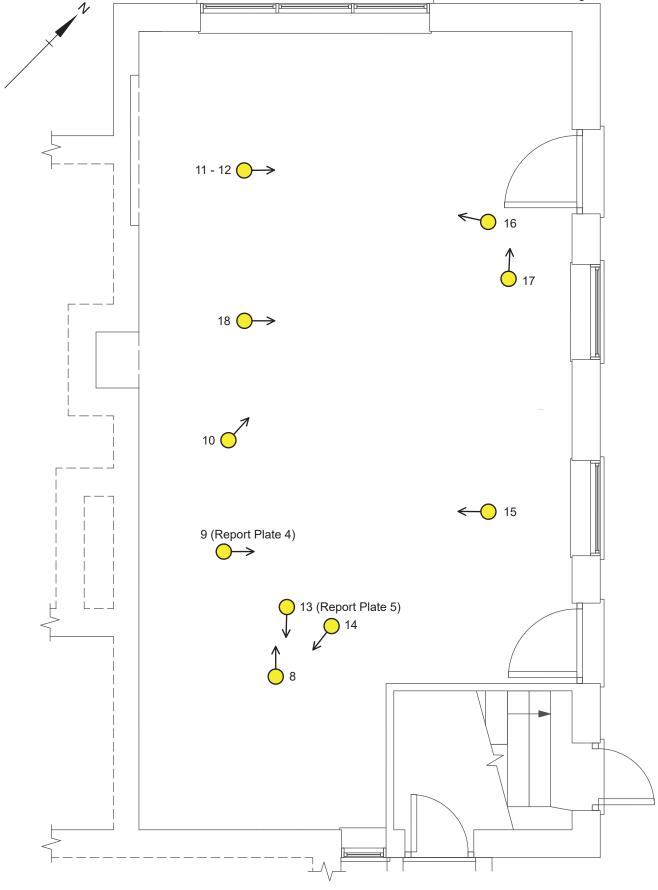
Ground floor ceiling during works 1:50 (After Native Architects, Drawing 305)
